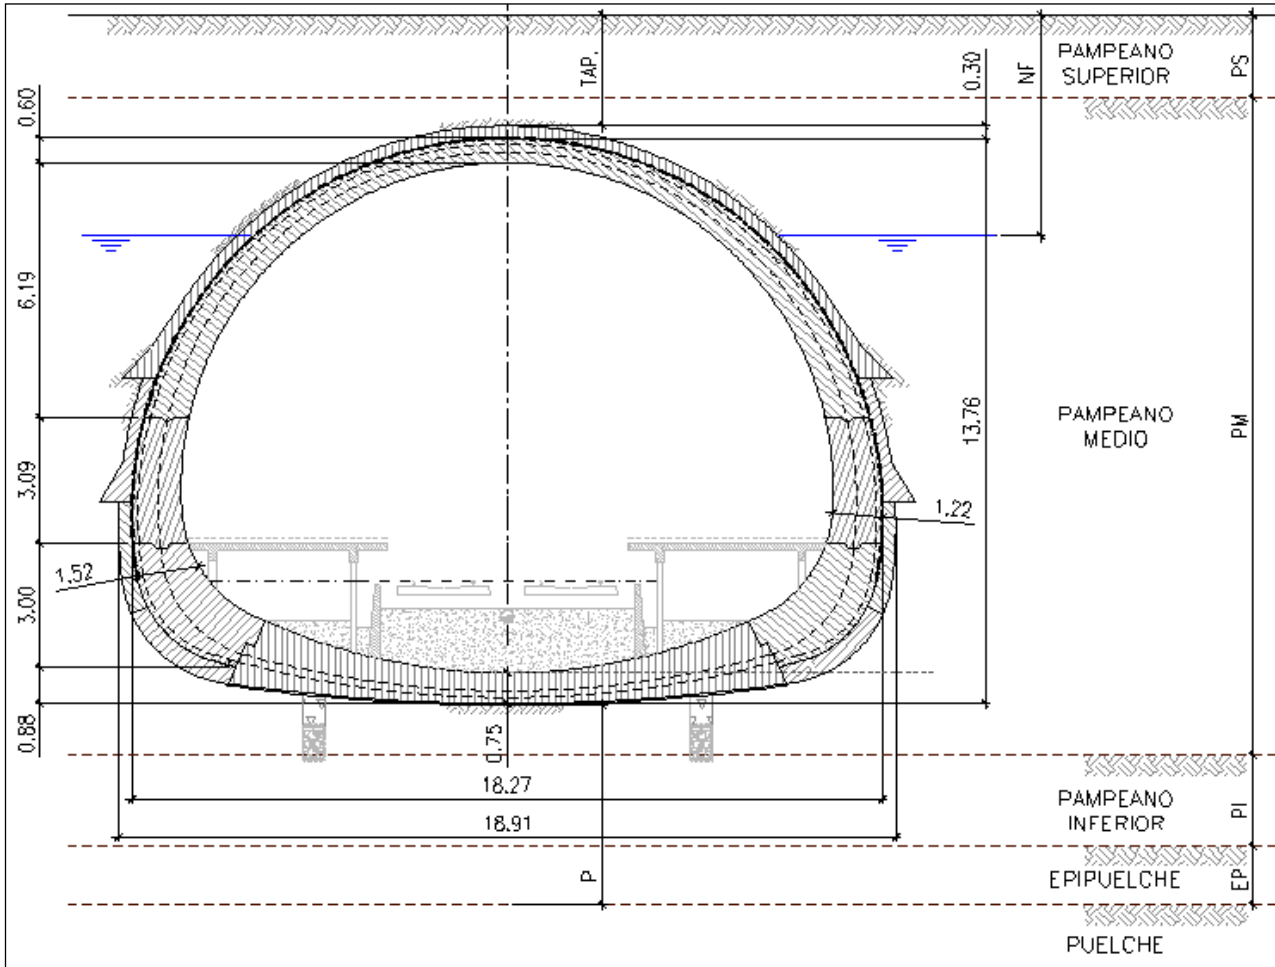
Cross section of Las Heras, Santa Fé and Córdoba stations.
